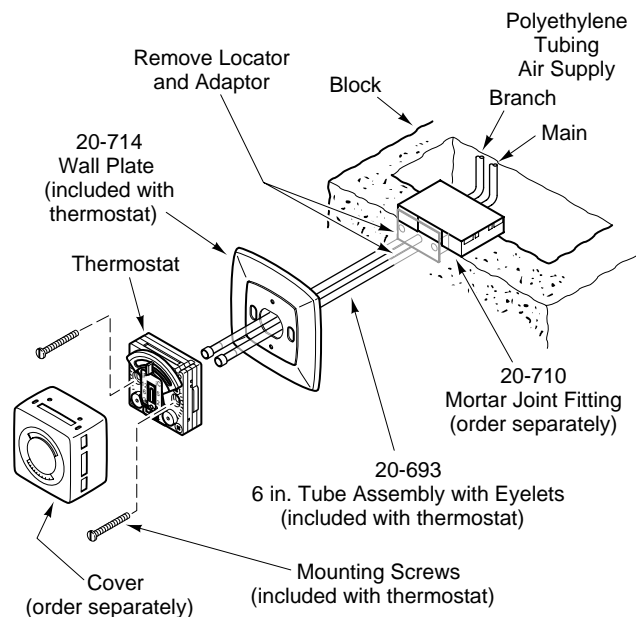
Thermostat Installation Using Pipehead in Masonry Wall.
